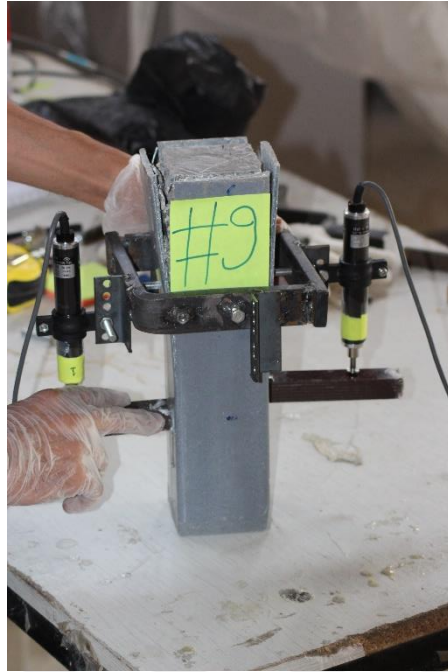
GRP tube (GC-SCC-G4-0%-W) after test
